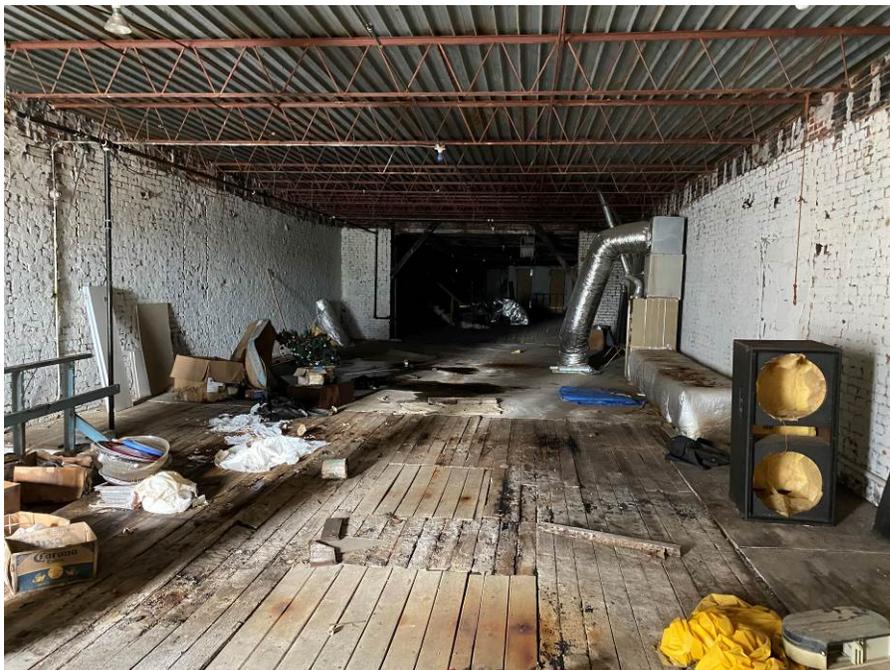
Second Floor Metal Deck and Steel Bar Joists Framing on 88 North Main
